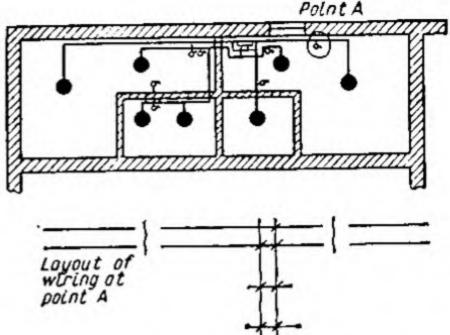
Interpretation of a floor plan for marking off lines of wiring at a given point.
